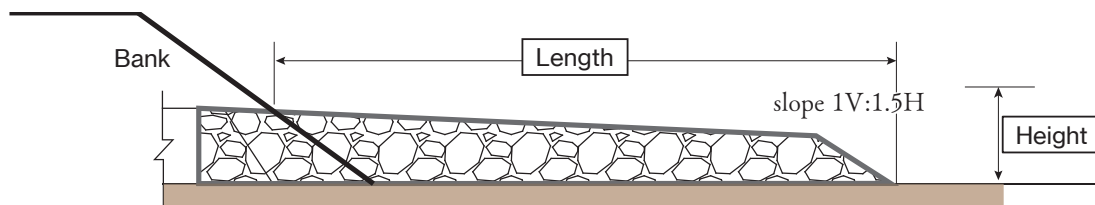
Example of a Stone Spur Dike Cross Section ¹⁾
